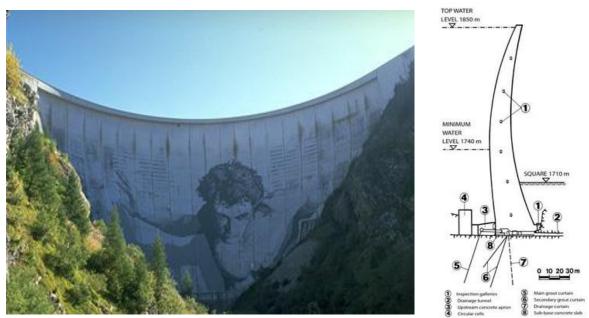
Tignes arch dam (left) (Photo EDF) and a typical arch dam section (right)
